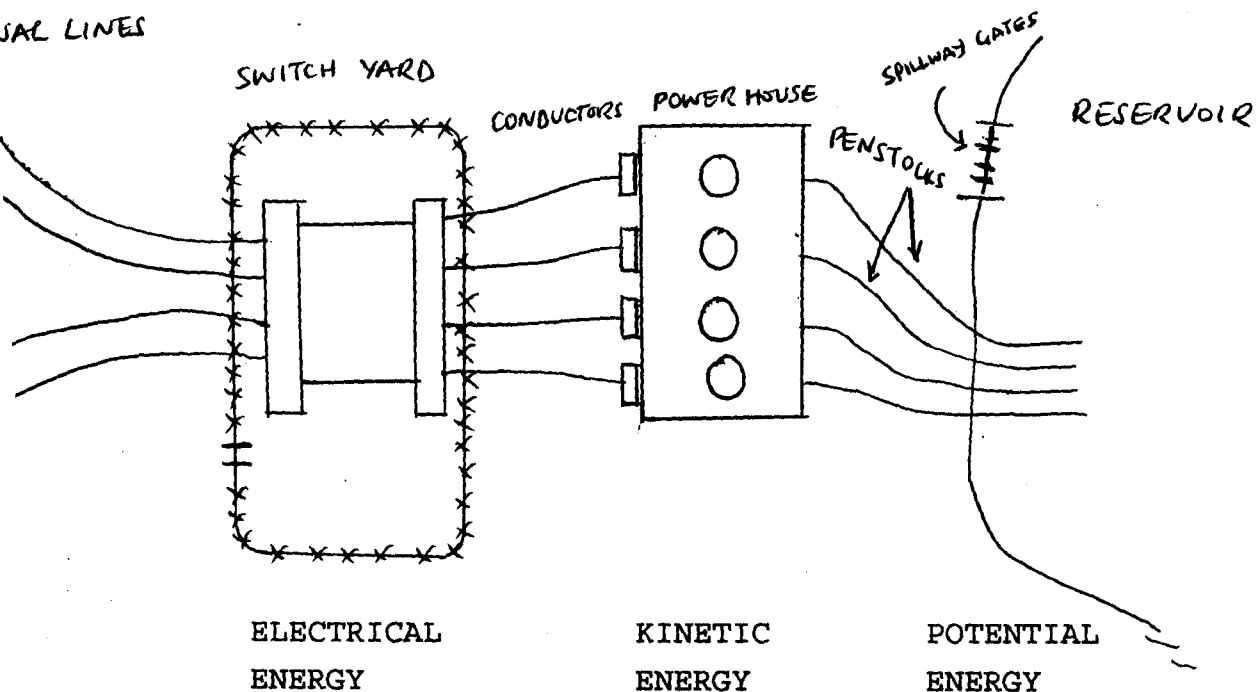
SITE PLAN; SHIOROR POWER STATION.
